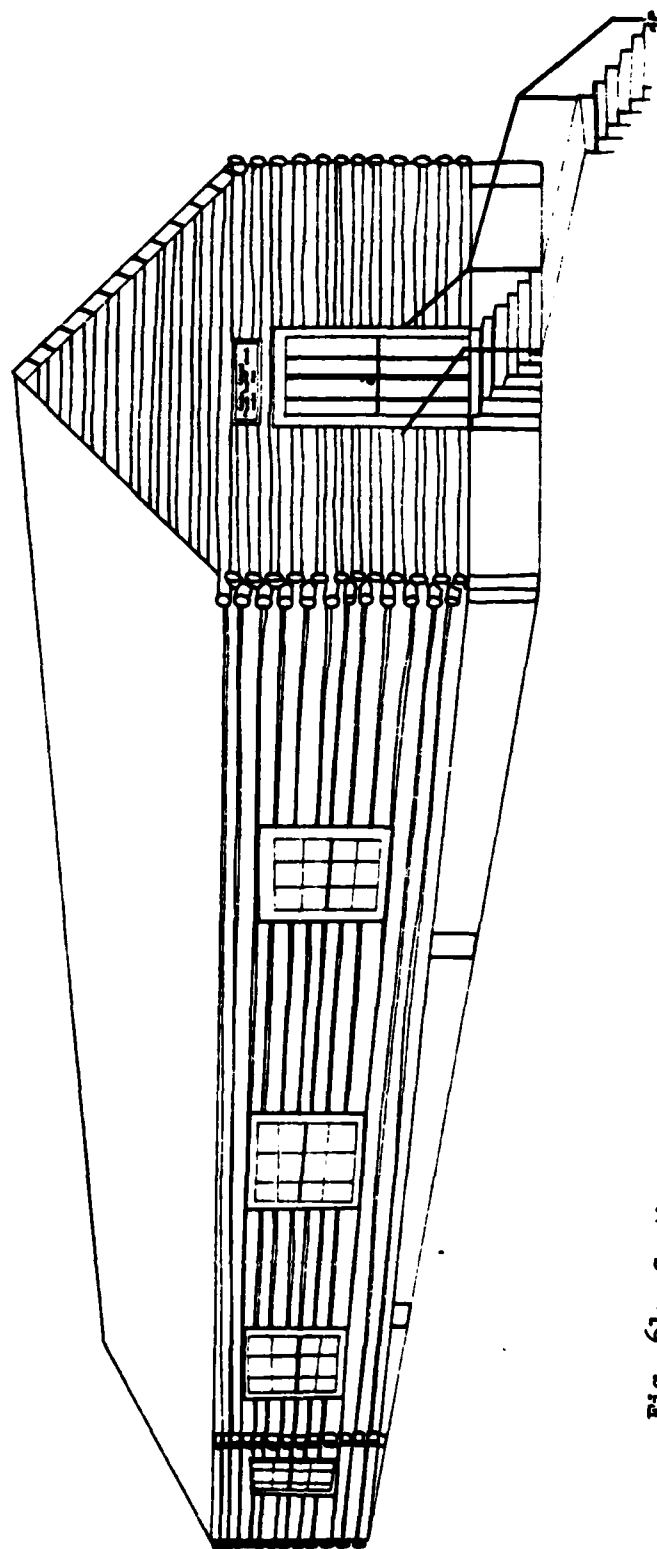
Southeast and southwest walls of Carter Chapel, Tract 914.
